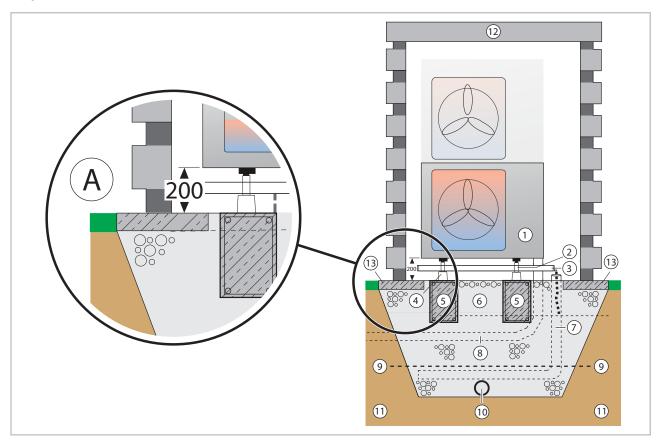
Condensate drainage, seepage of condensate and strip foundation (cross-section)
